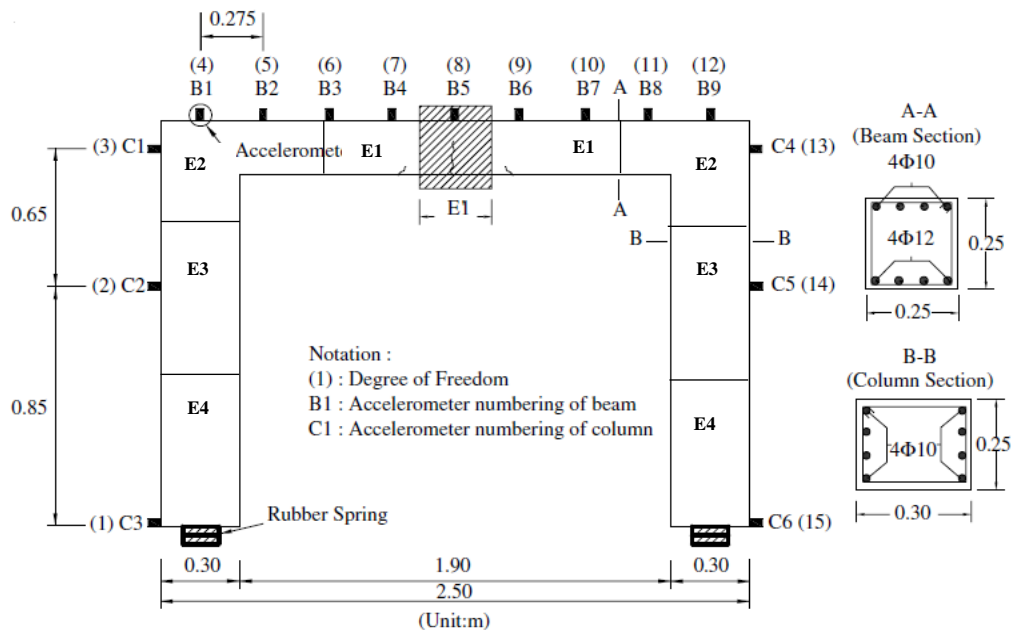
RC frame: Geometric dimensions and accelerometer arrangement (Fang et al. 2008)
